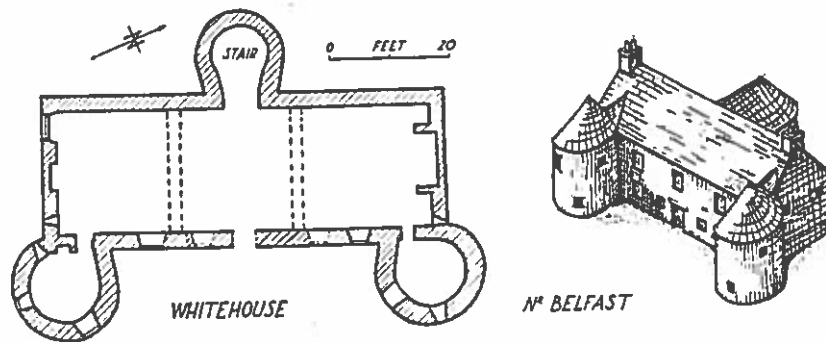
Plan and isometric reconstruction of the 17th century house by the shore at White House, north of Belfast. This rambling squat house seems to have had few windows at ground floor; even those traceable at either end of the front face may be insertions. Those at first floor have jambs of 2-inch brick, but this remained in use through the 18th century here. It has some pistol-loops in the gable walls and round towers.
